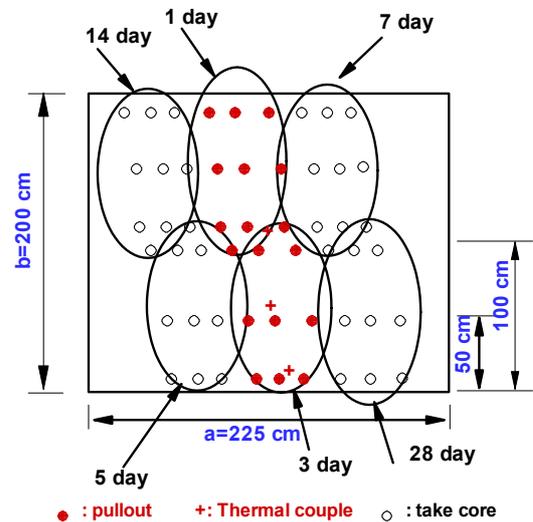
Take-core, pullout and thermal couple positions of a concrete slab
